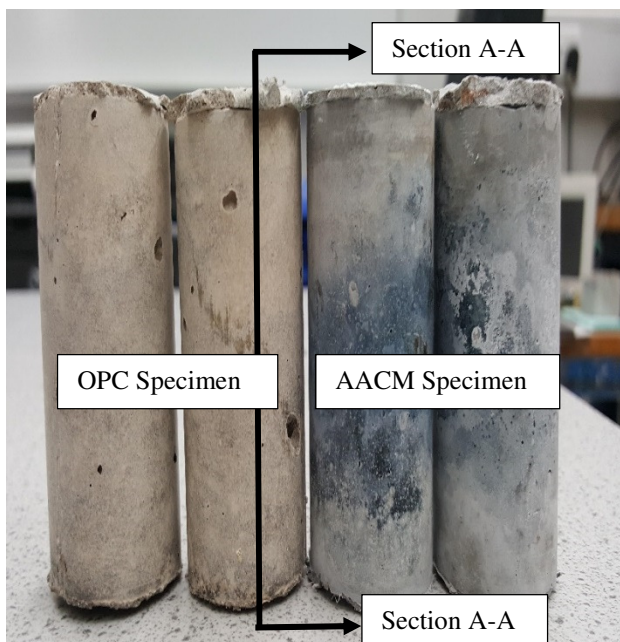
9: Demoulded cylinders showing the section A-A of splitting
